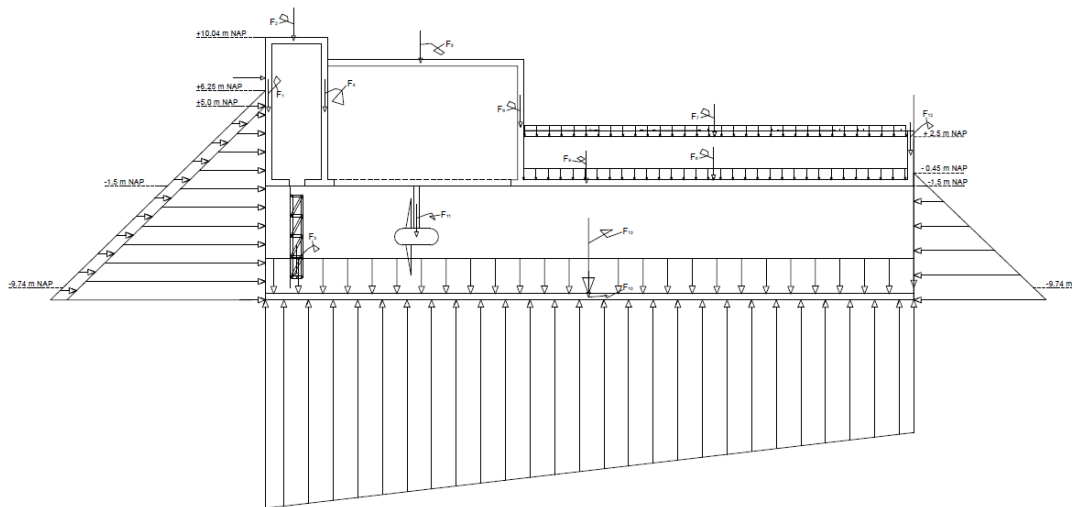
LOAD SITUATION AT EXTREME CONDITIONS
